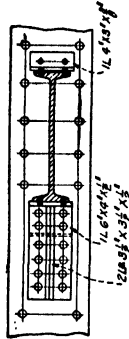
Standard connections beams to columns for 27-in. and 24-in. I-beams with reactions not more than 64,000 lb.
